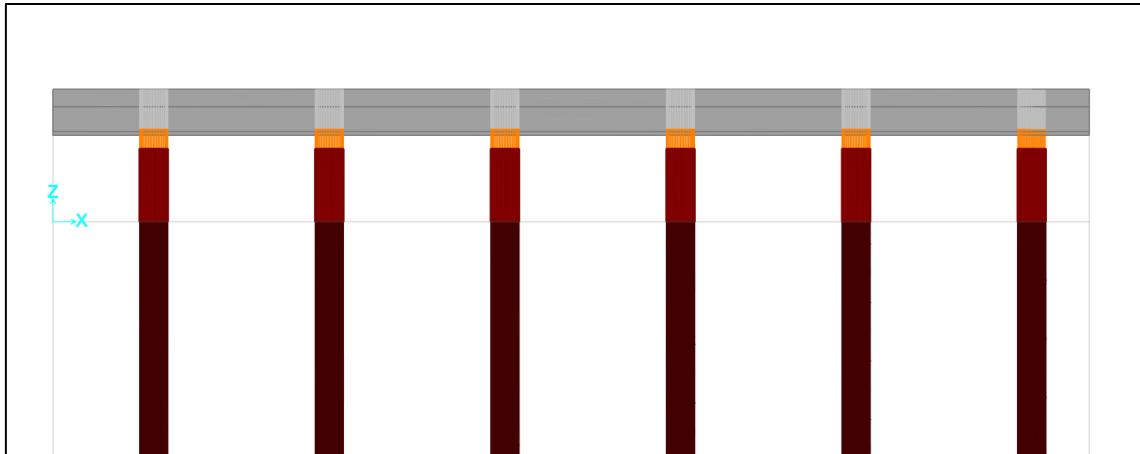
Pile-to-deck connections in SAP2000, extruded view.
